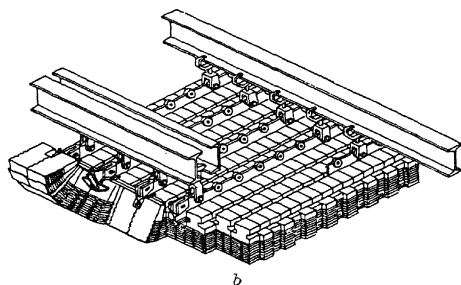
Detrick tile corrugated on all sides prevent spalled refractory from falling into furnace.
